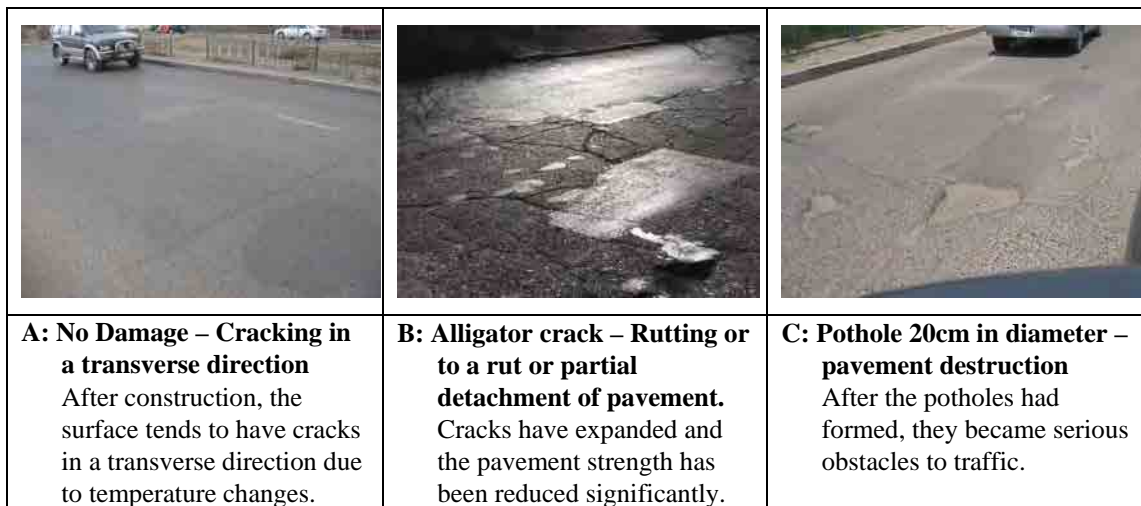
Typical Pavement Damages in Ulaanbaatar City
